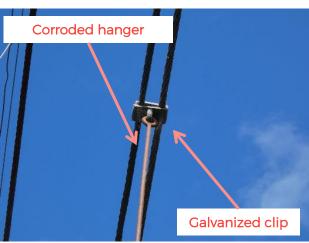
Surface corrosion on hanger rod compared to galvanized cable clip
